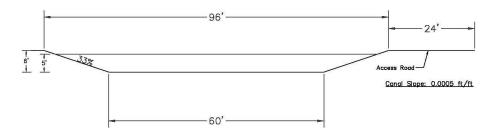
Bypass Canal Section – 1,500 cfs Capacity
